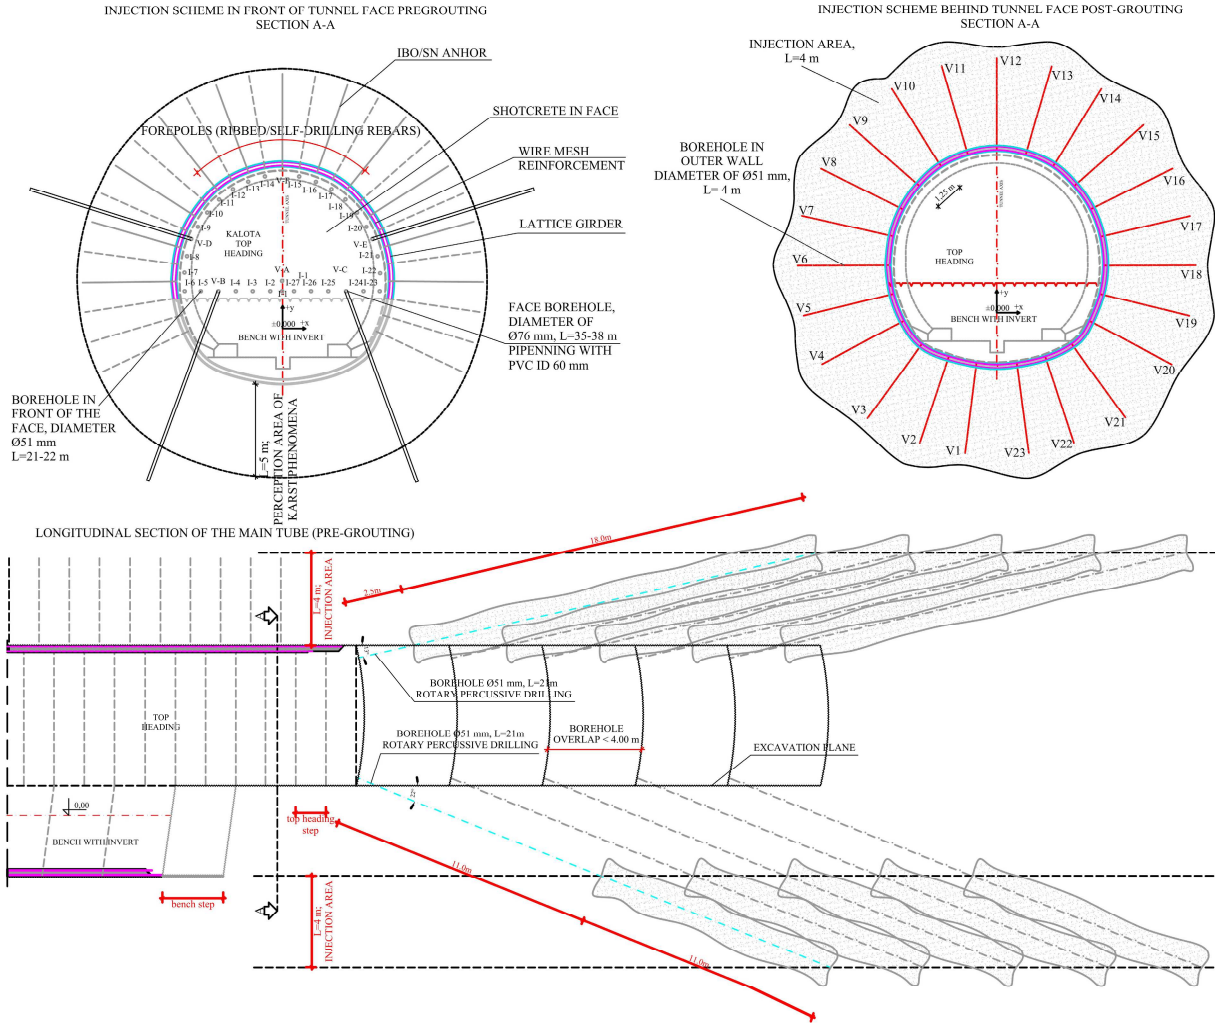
Diagram of grouting works on the Divača–Koper tunnel [22]
